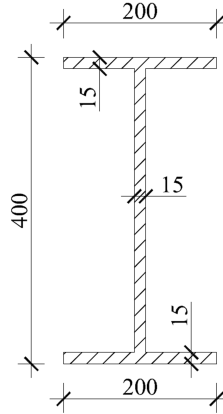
Geometry of the I400 GFRP profiles used as main girders of the full-scale prototype (dimensions in mm).
